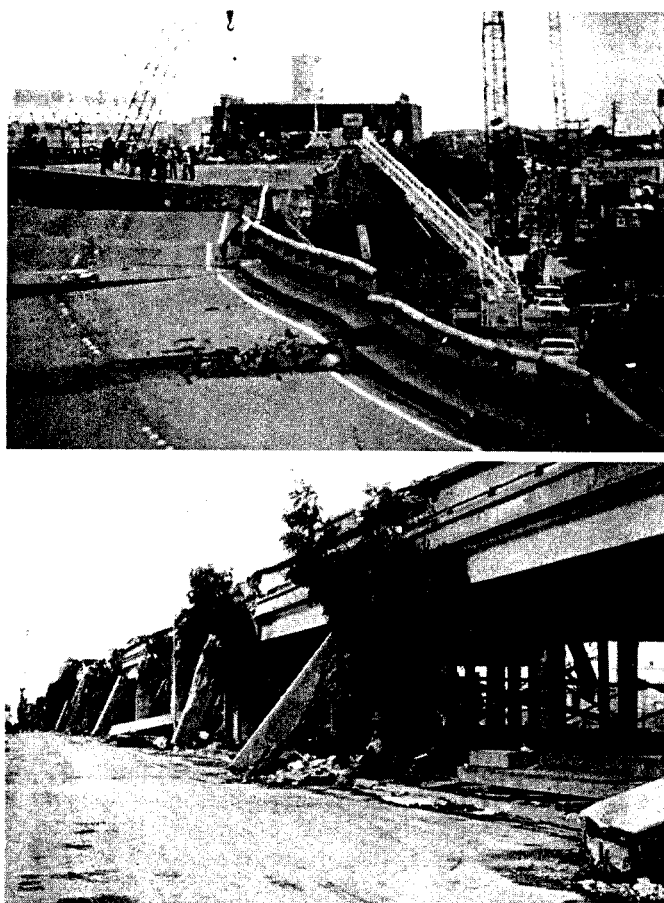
I-880 highway in west Oakland: (a) looking longitudinally south from north end; (b) looking at elevation from west side.
